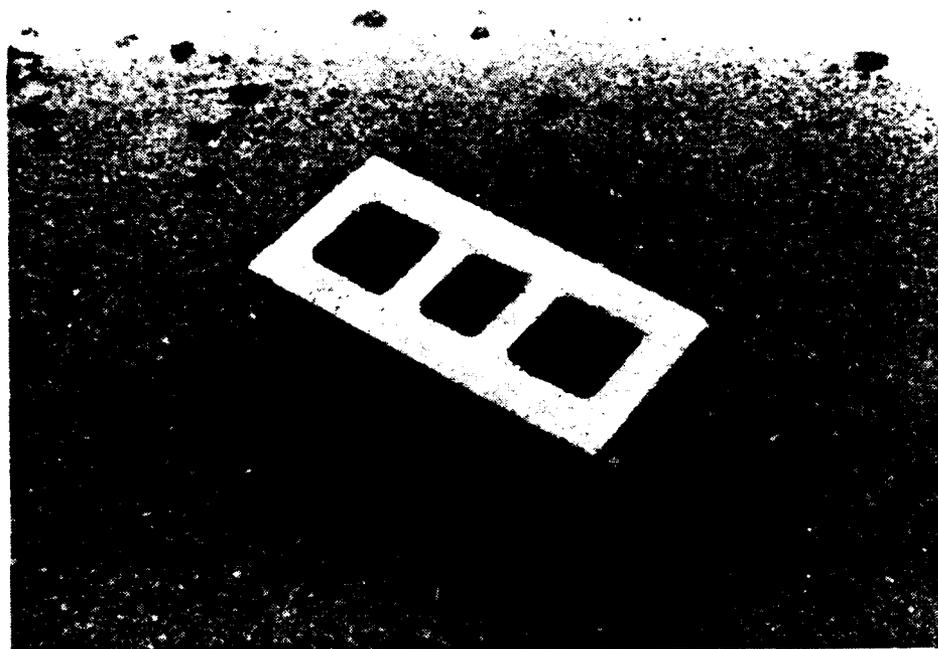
Three Core Concrete Masonry Pier Unit.
